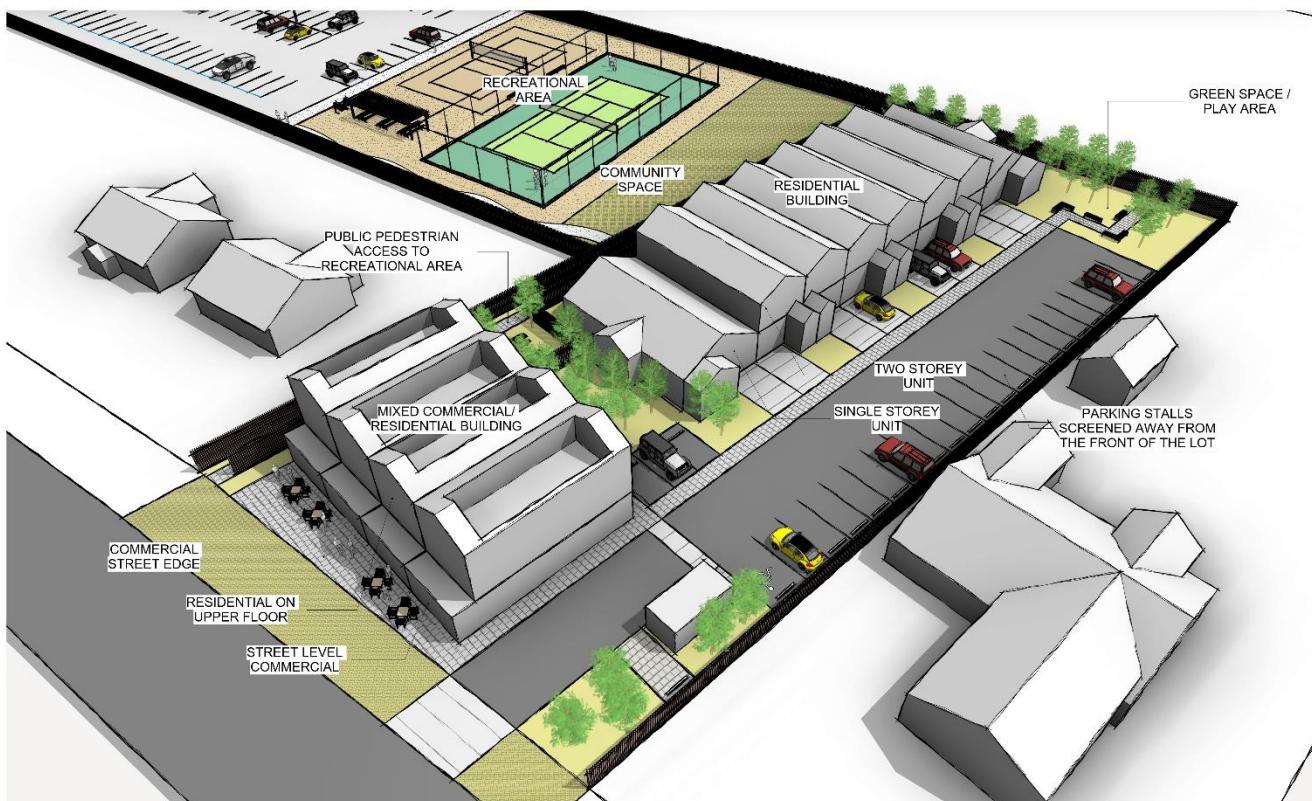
Conceptual Perspective Showing Proposed Building Improvements
